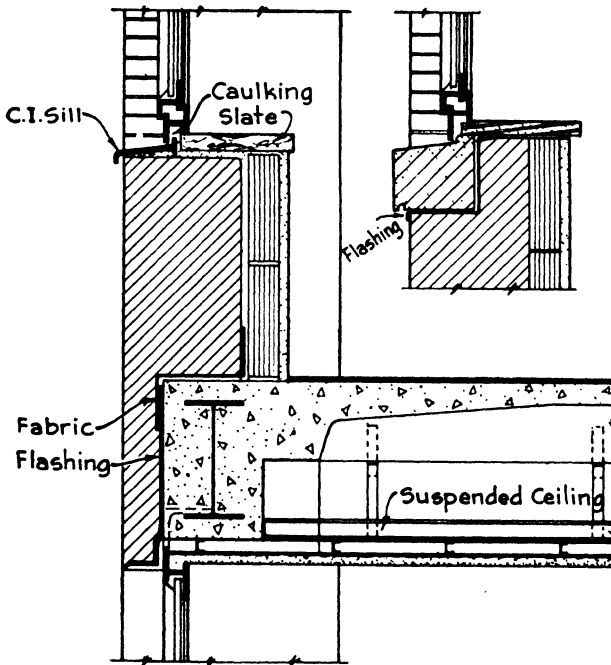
Wall Flashings at Spandrel and Sill.
